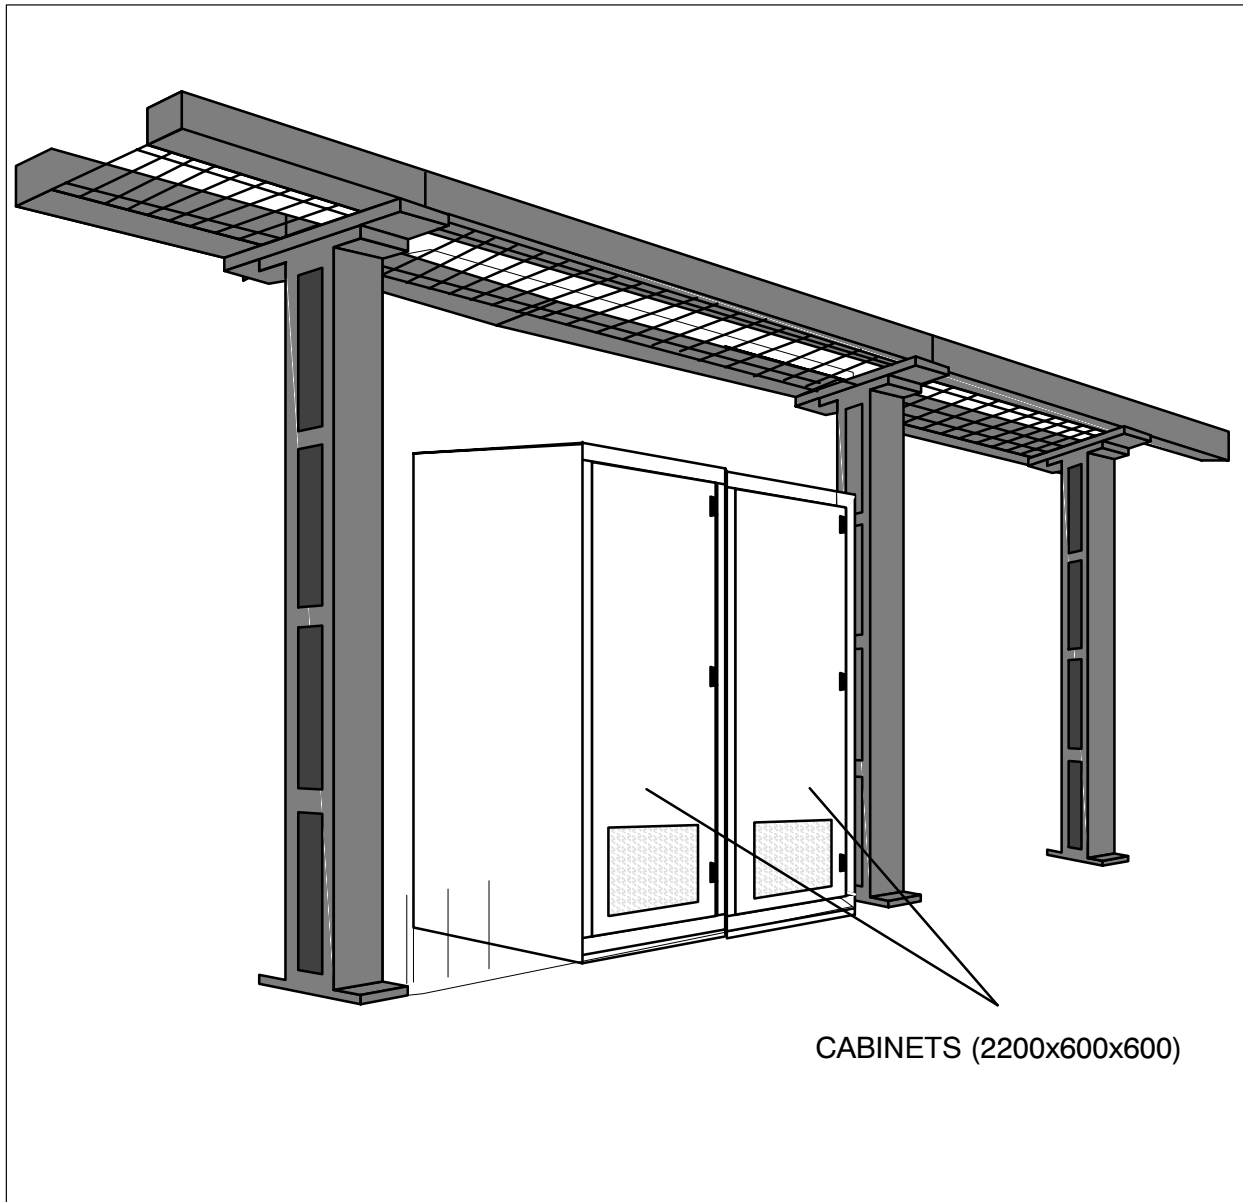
View of cabinets installed in an exchange with 2600mm structures
